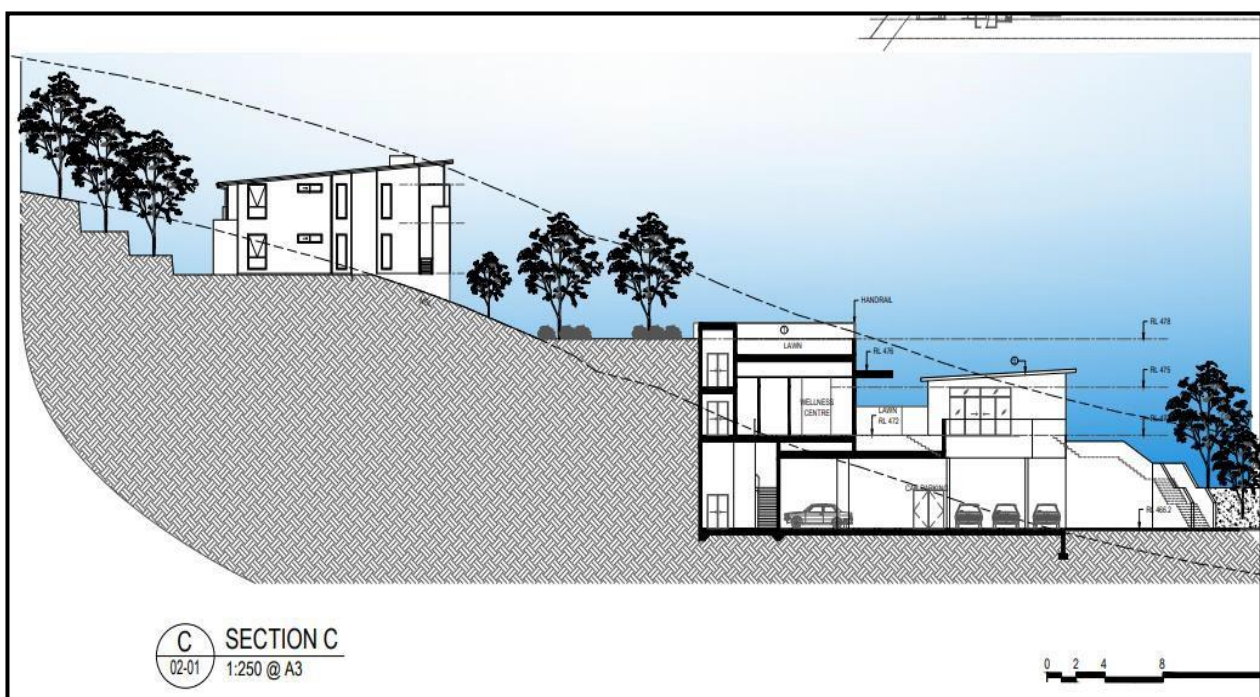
Proposed central facilities – Section with Natural Ground Level (NGL)
